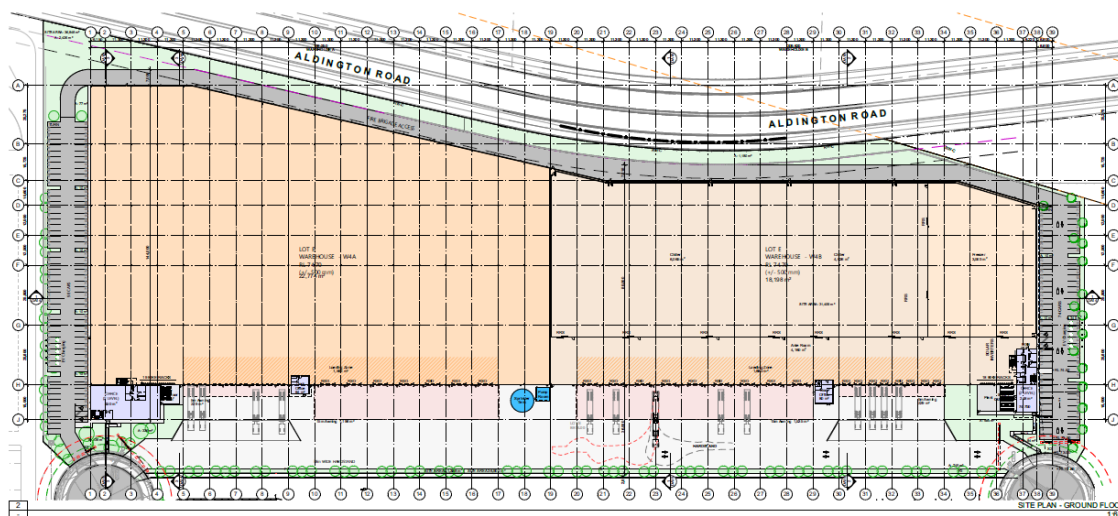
Site Plan by DTA Architects Revision P5 dated 17.09.2025
